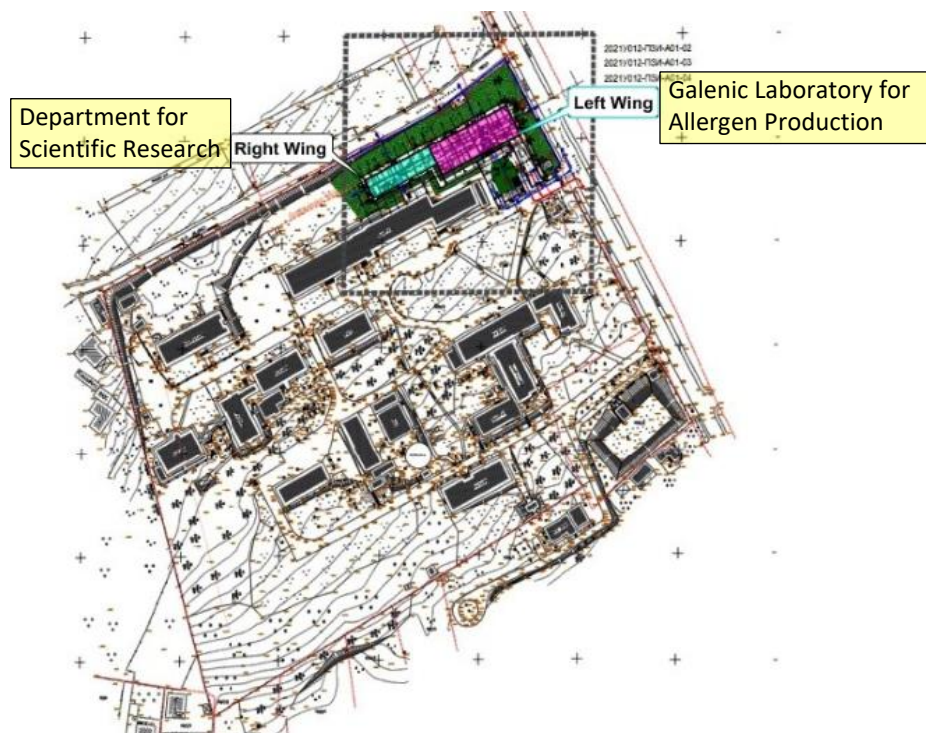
Left and right wing of the new BSL-3 building at Torlak Institute
